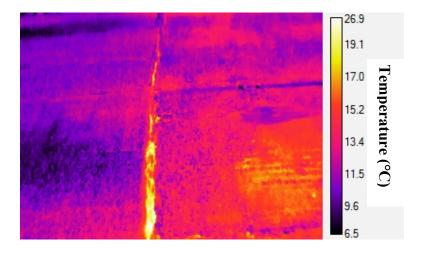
Asphalt and concrete pavement surface temperatures at 9:00 a.m.
